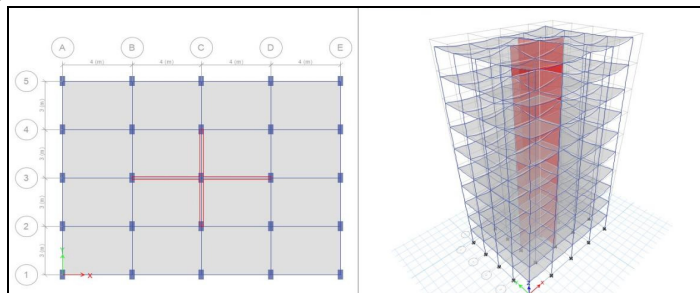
Plus pattern frame with shear wall and flat slab
